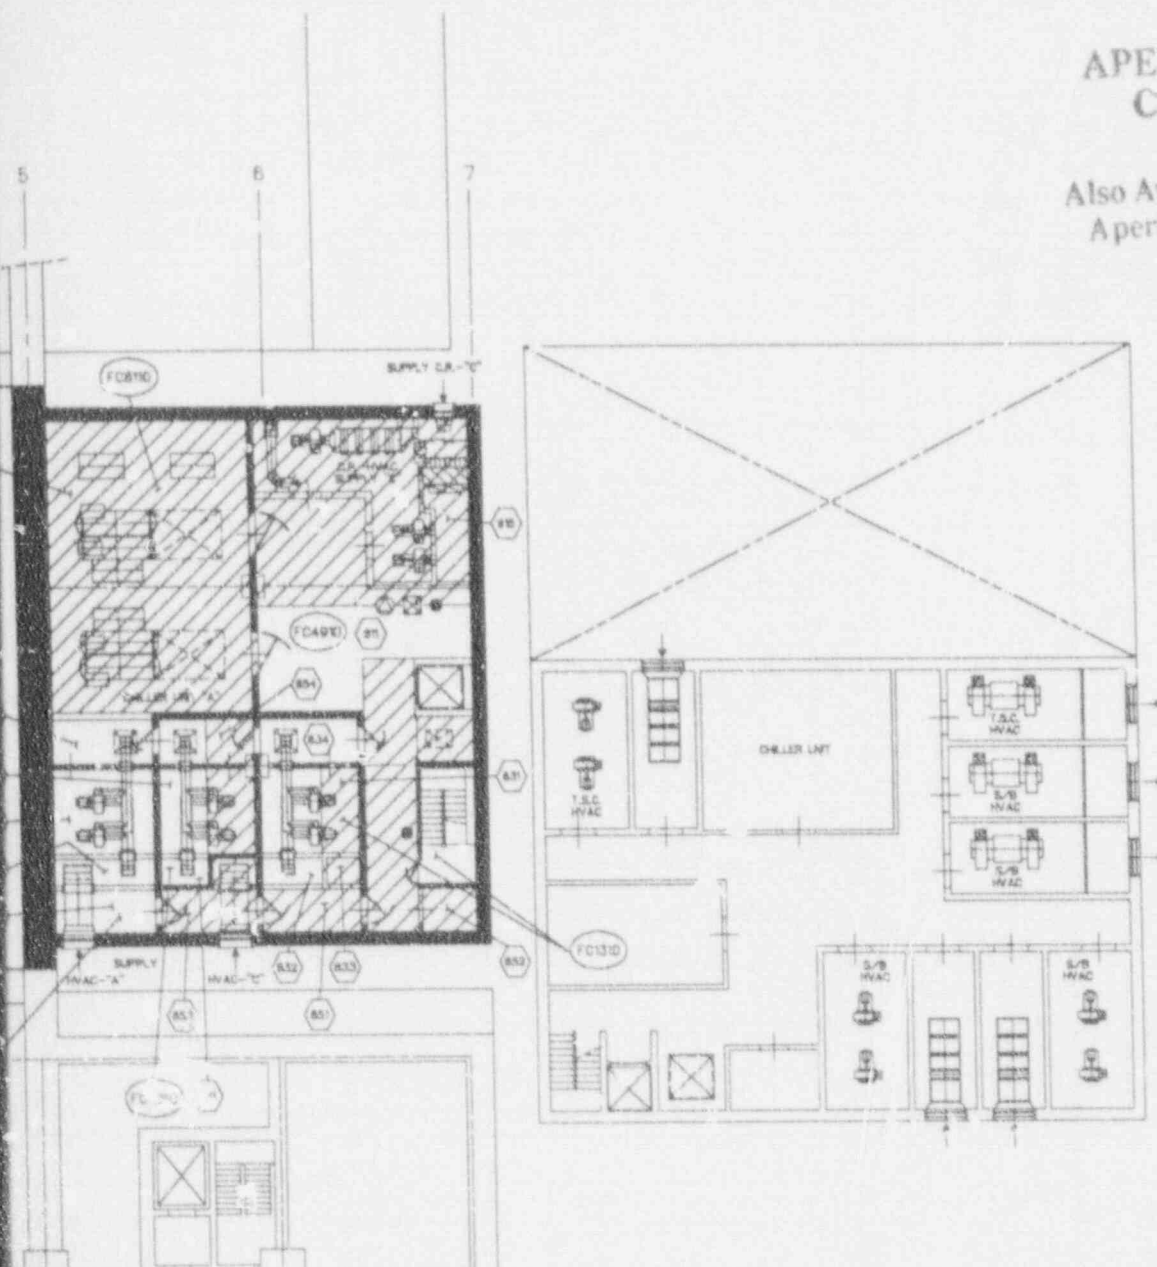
A.4-16 CONTROL BUILDING FIRE PROTECTION AT ELEVATION 12300mm
